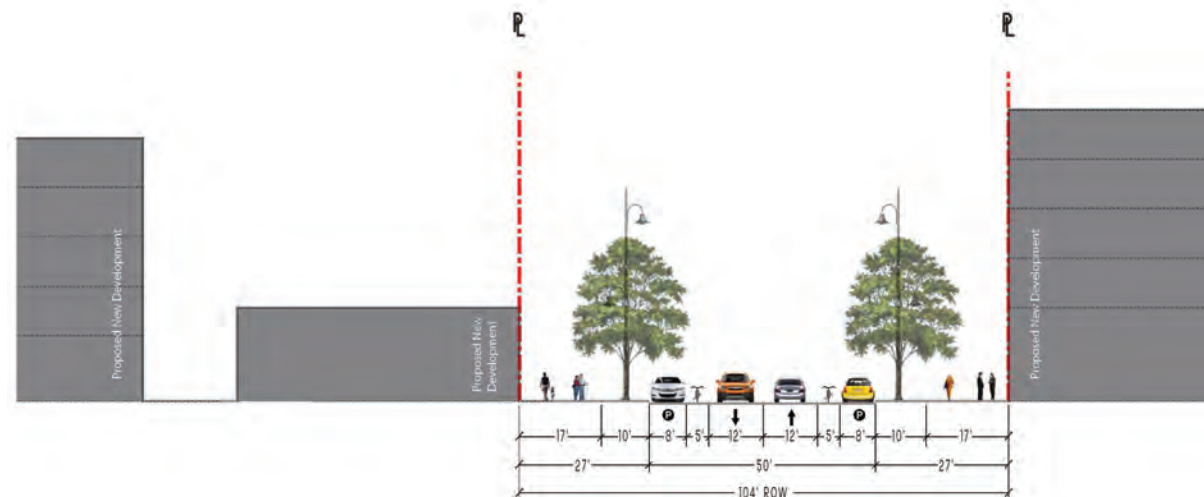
Good Hope Avenue Extension Illustrative Street Section
